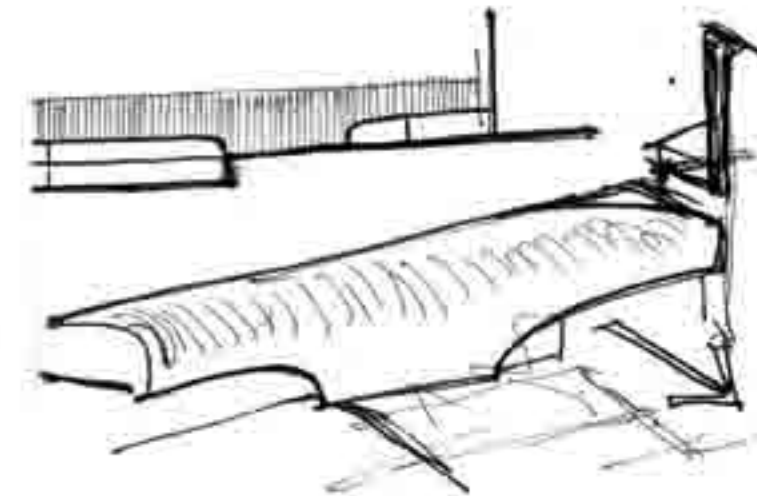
Conceptual design development of platform roof wrapping over to become the facade, opening up at access points
